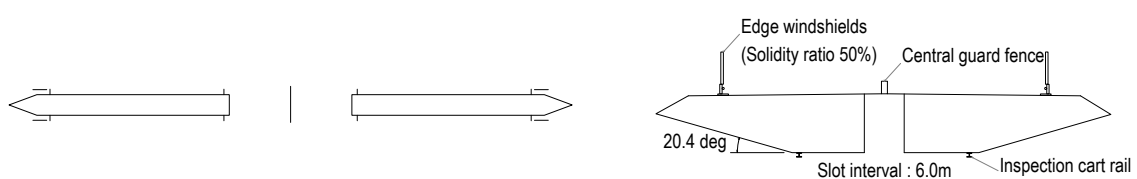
Deck section of future super long span bridge in Japan (left) and narrow center-slotted deck proposed by Tokoro *et al.*, 2002 (right)
